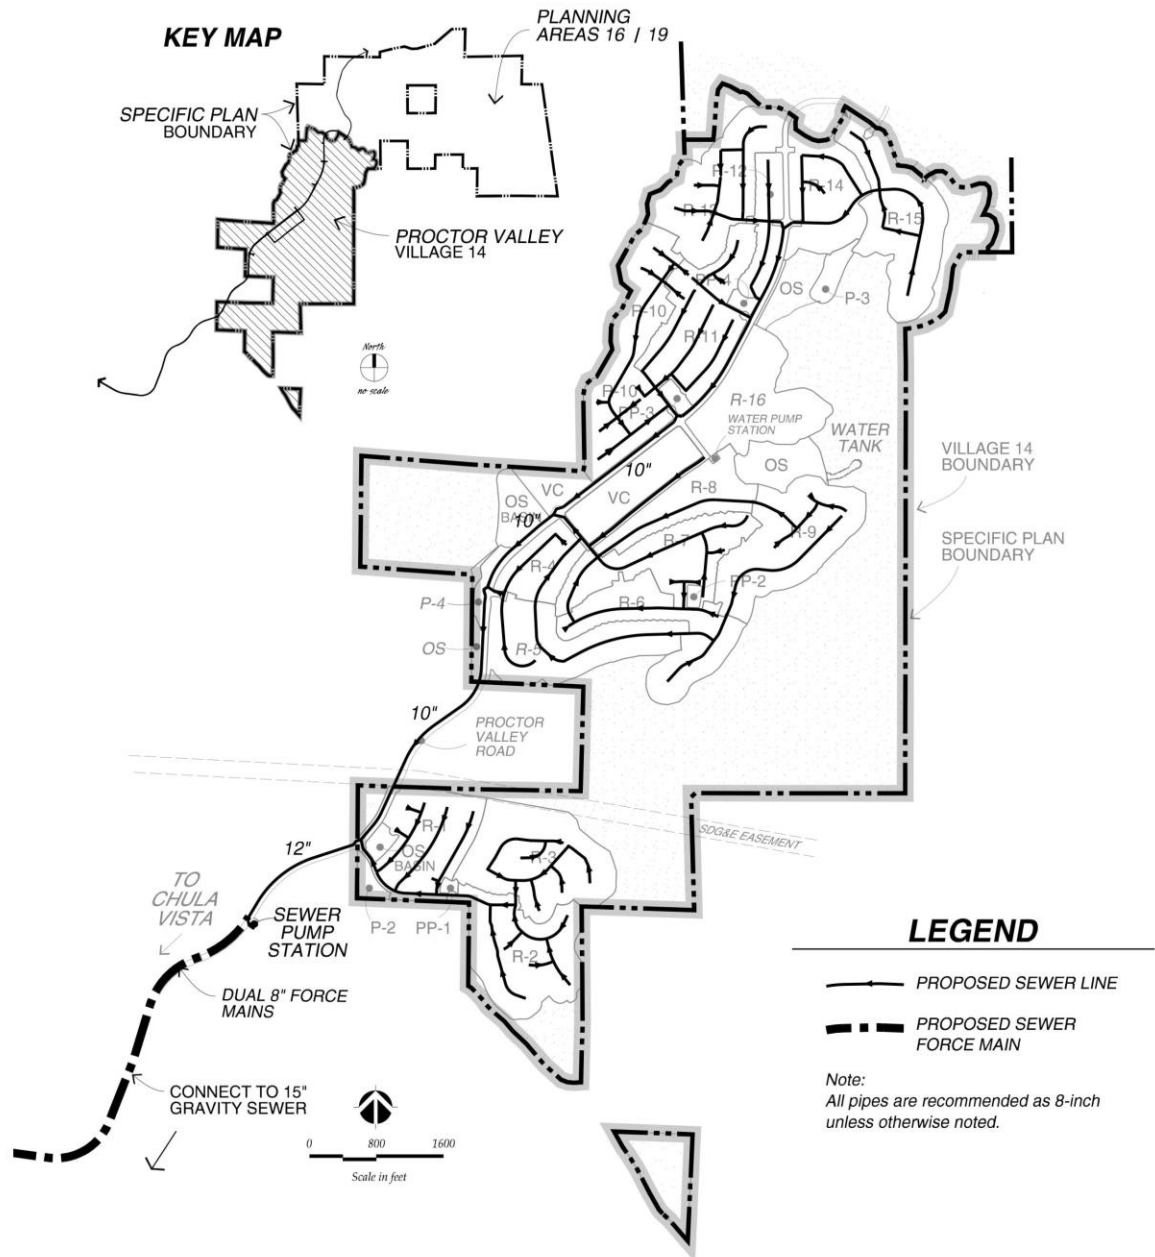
Conceptual Sewer Plan (On-Site)
